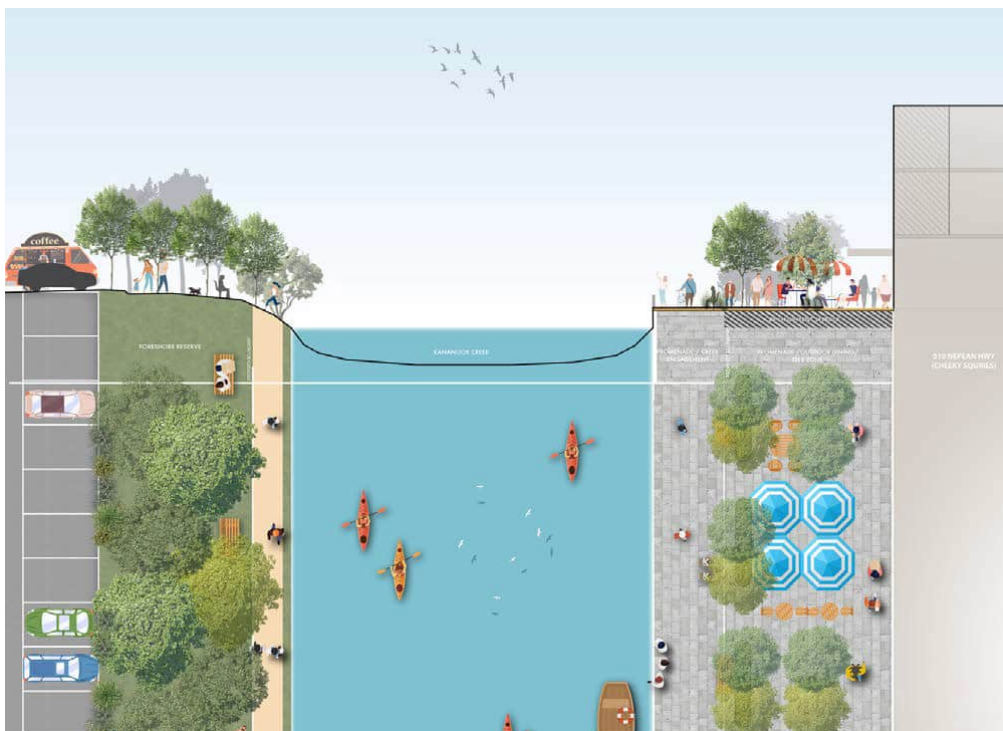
Example plans and cross sections showing how Kananook Creek Promenade could be extended.
